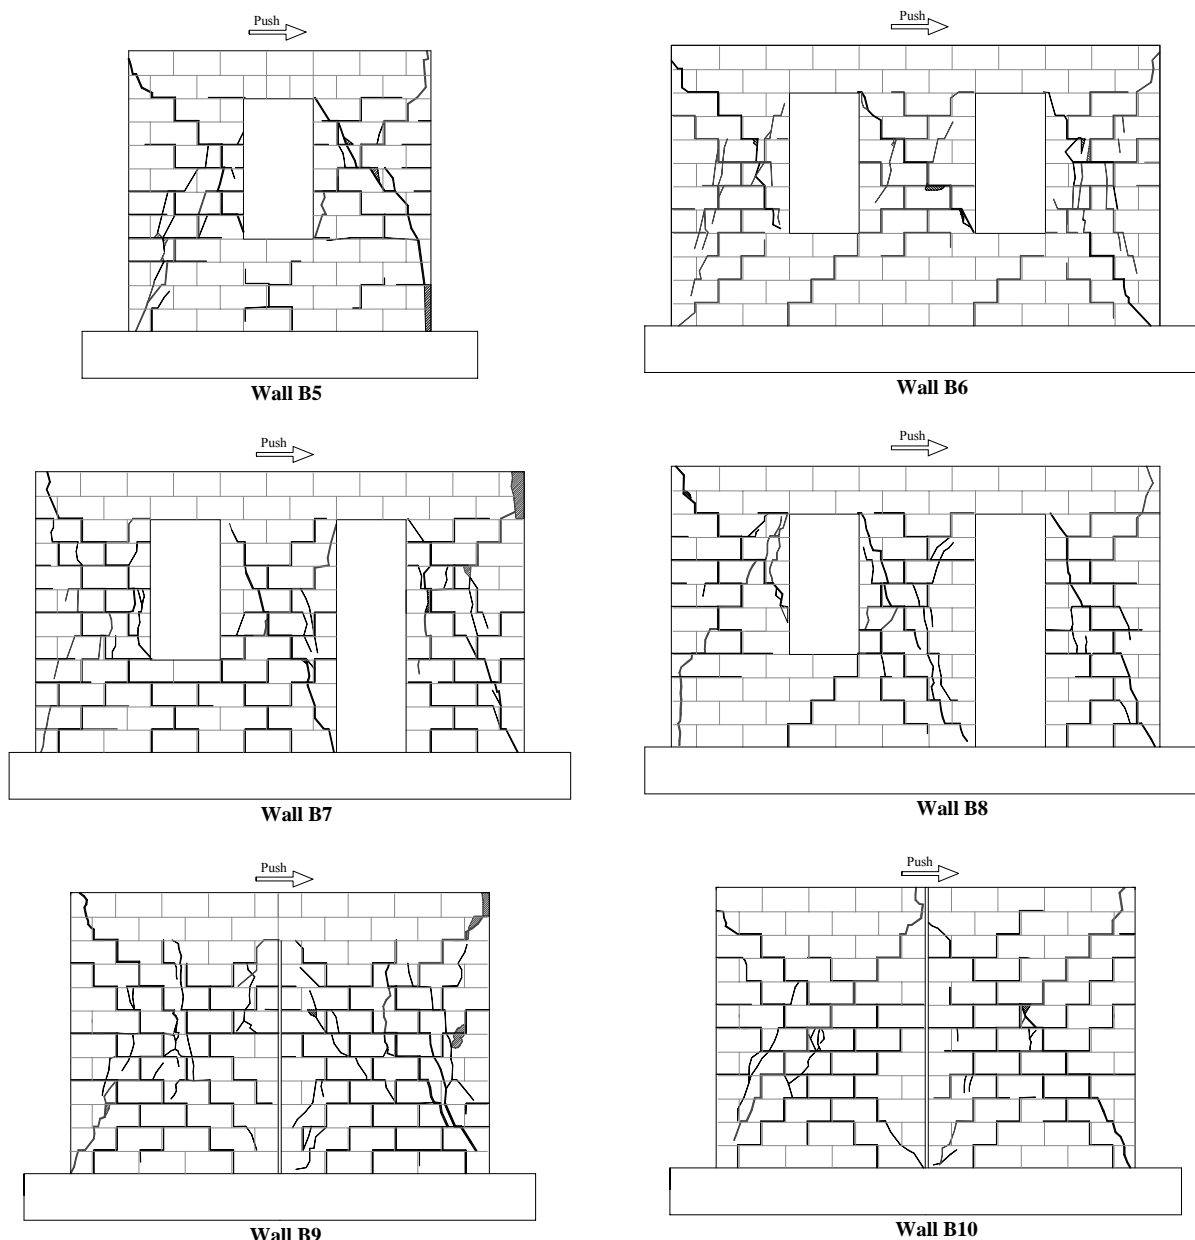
Series B, masonry wall cracking patterns at end of testing at end of testing (continued).
